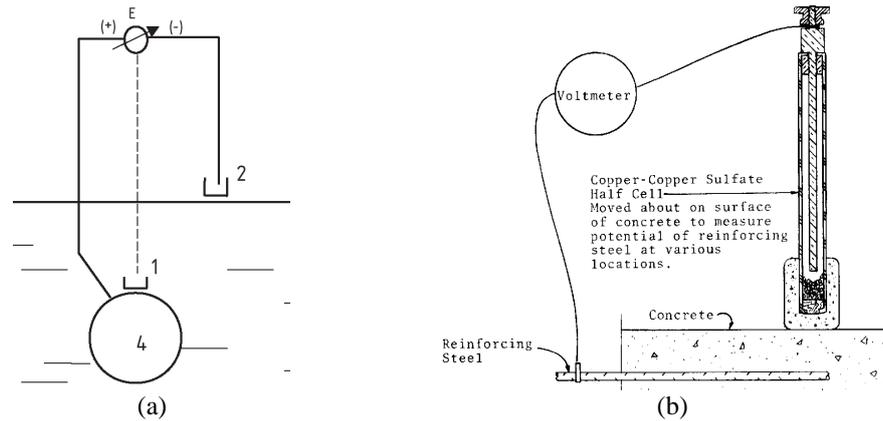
Potential measurements; (a) Pipe or buried structure, (b) Reinforcement rebar in concrete
